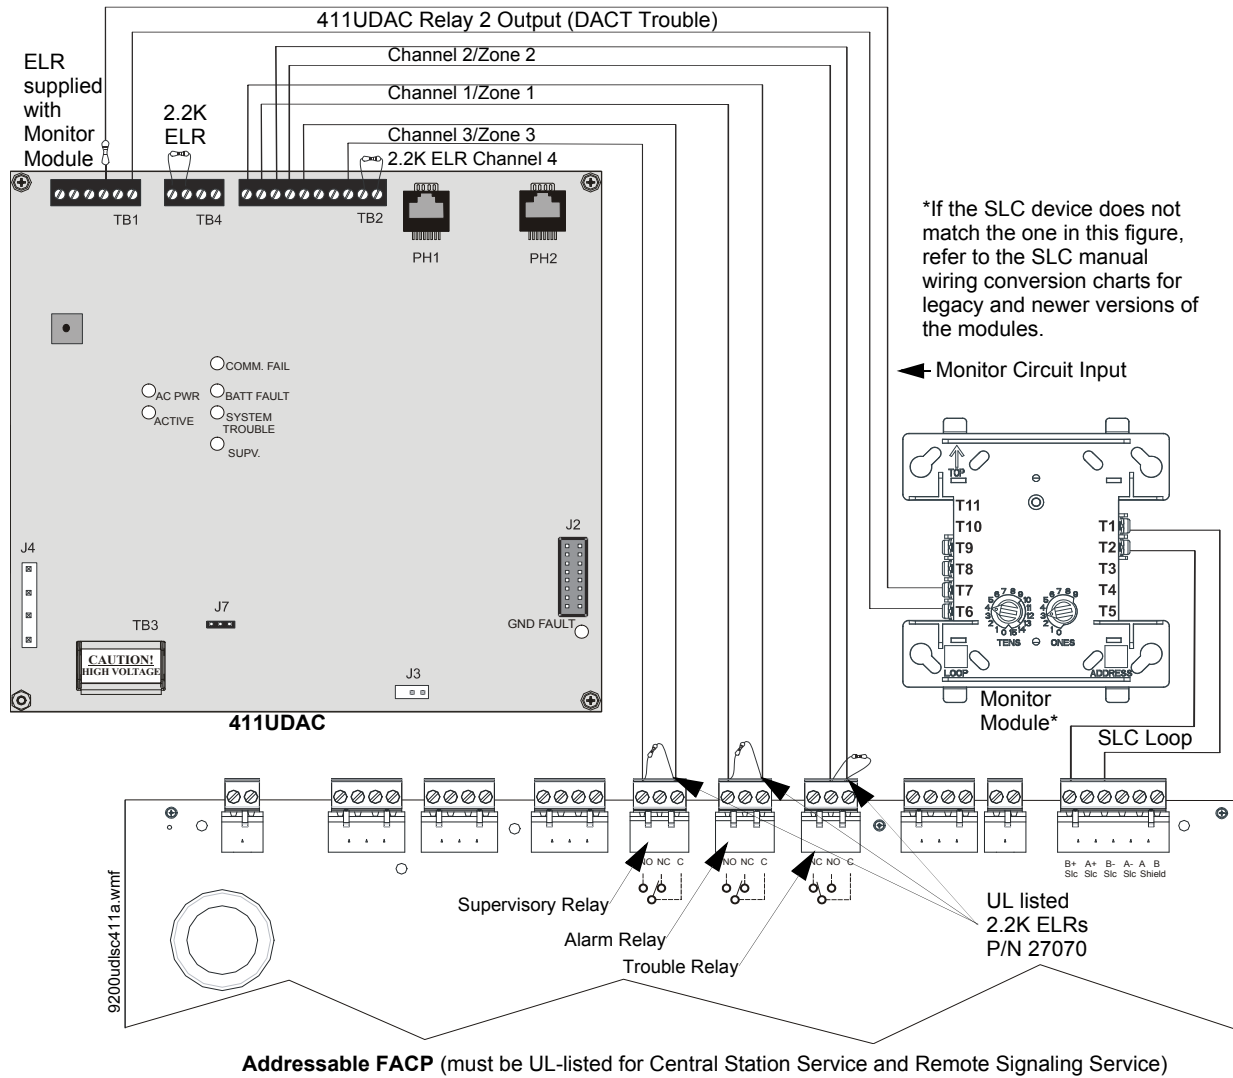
Typical Addressable FACP Connection to 411UDAC
